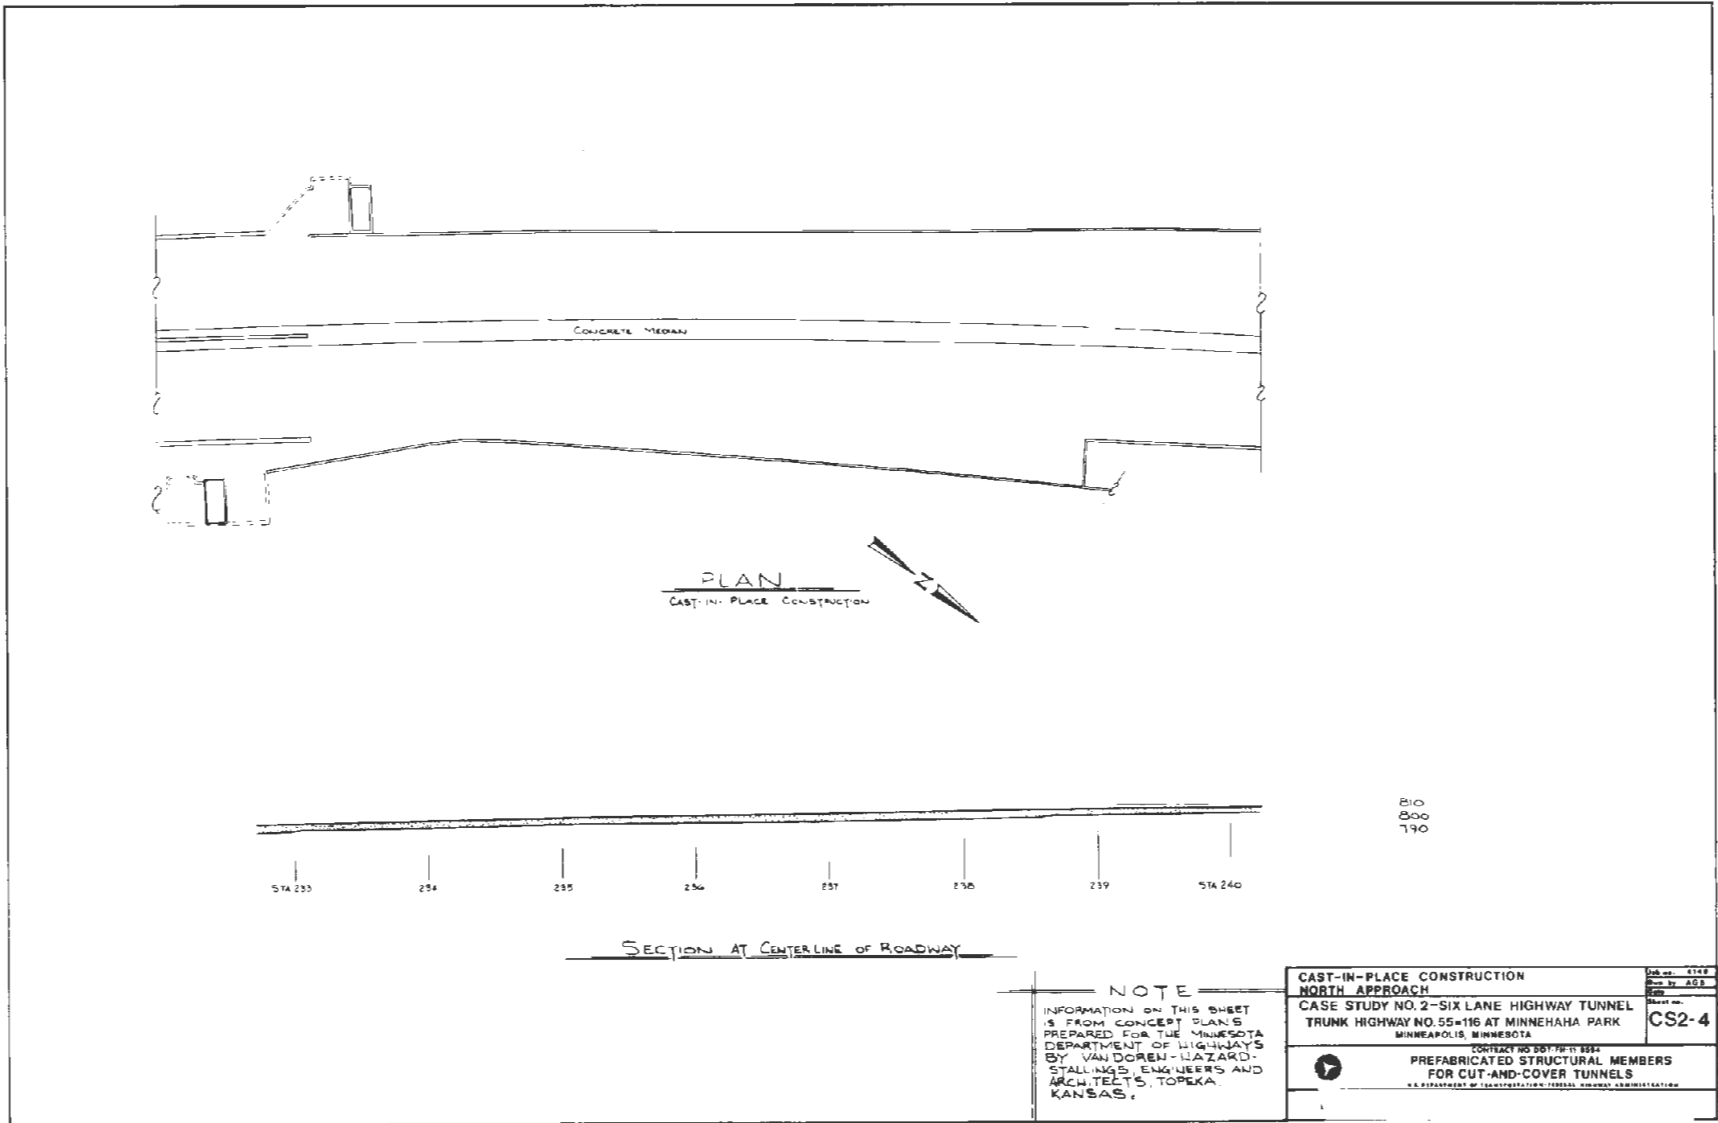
Case Study 2: Cast-in-place construction. North approach
